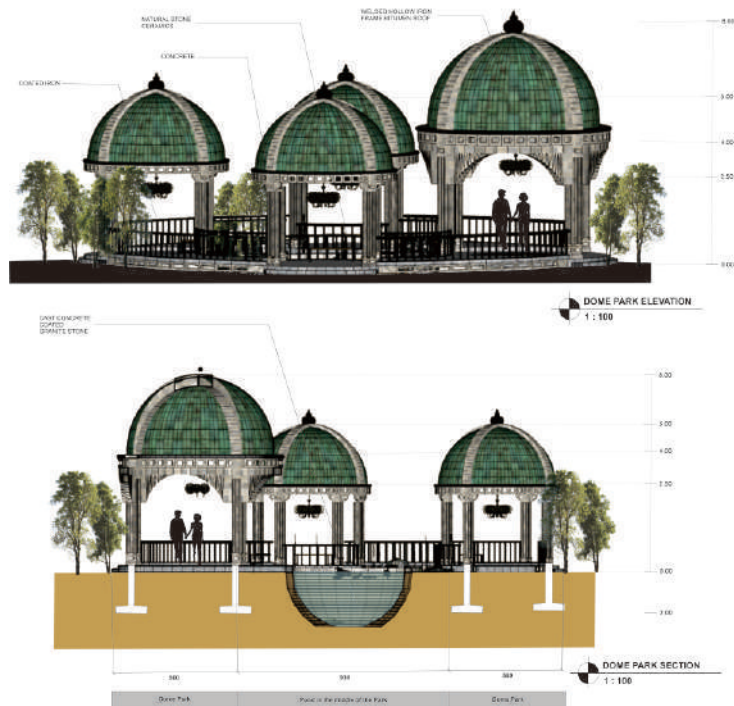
Dome Park Section & Elevation . Source : Author
